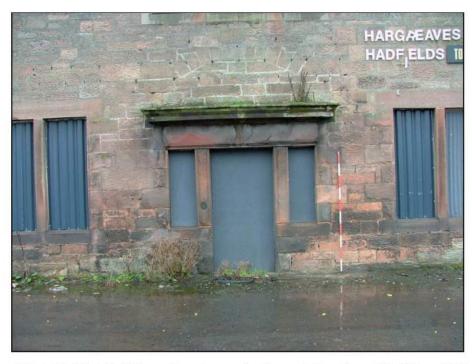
Detail of the main entrance in the east elevation of Building C (Scale = 2m)
